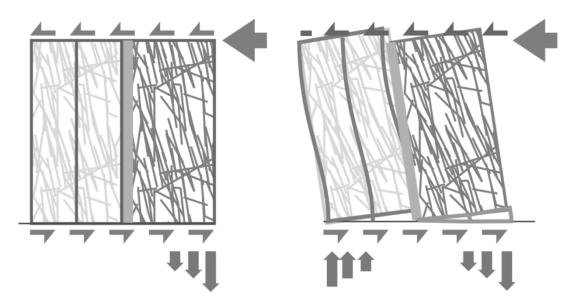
Diaphragm action in a shear wall before and during wind load.
